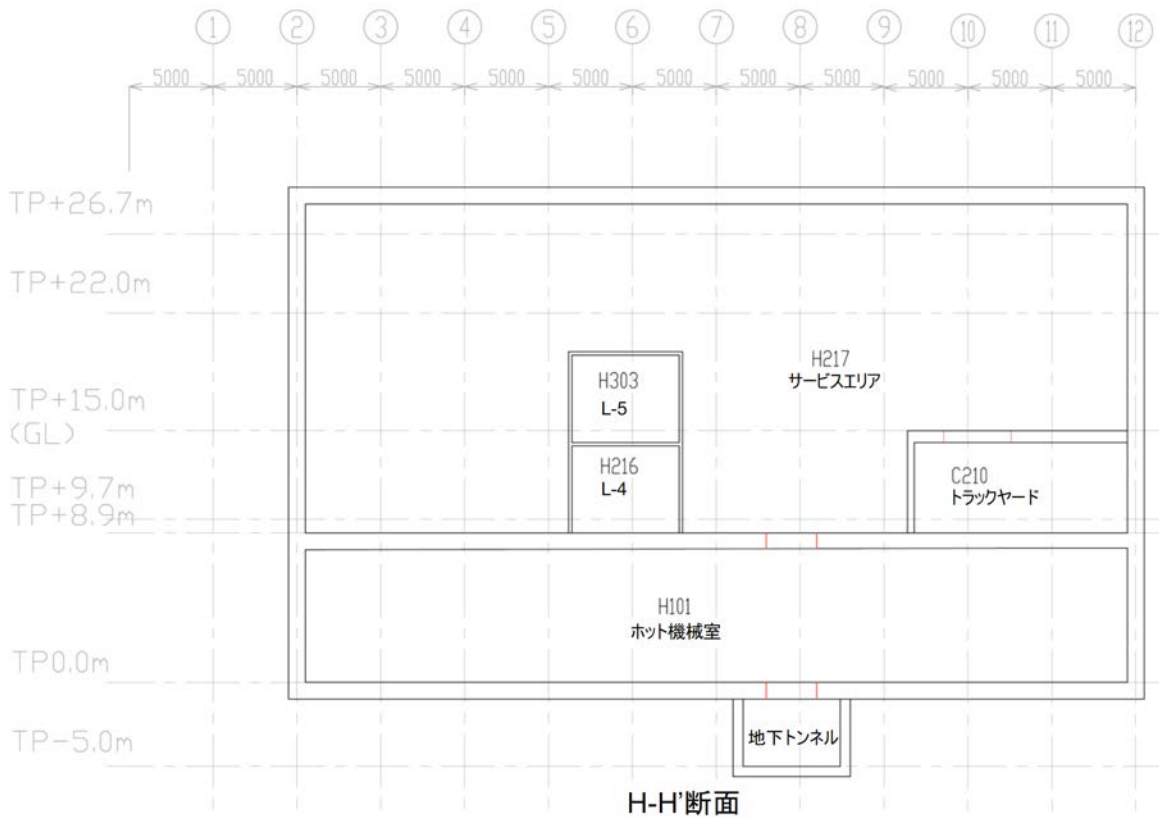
Elevation view of PIE facility (H-H').
